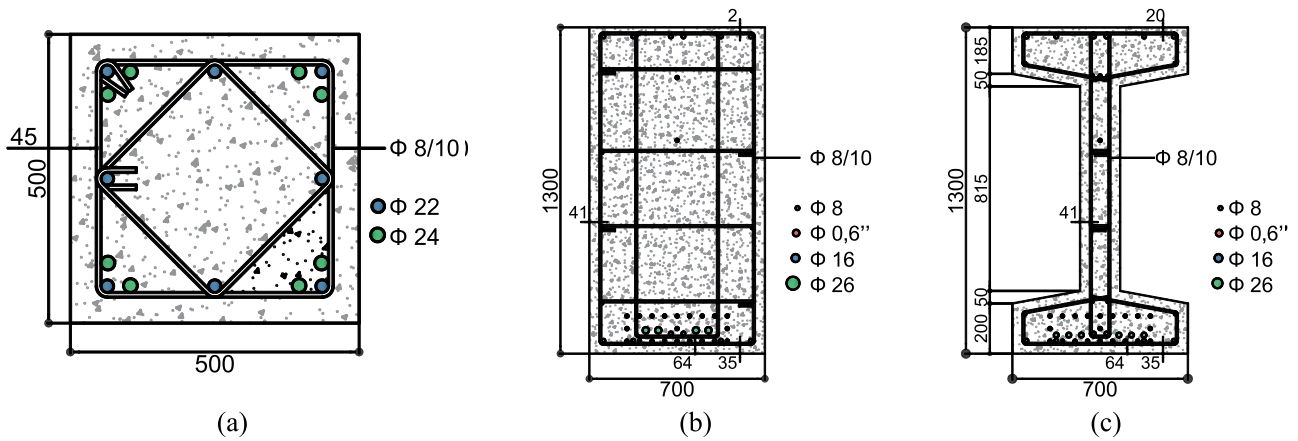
Elements detailing: a) column base (Sections 1-1), b) beam end (Sections 2-2) and c) beam centre (Sections 3-3). Dimensions in mm.
